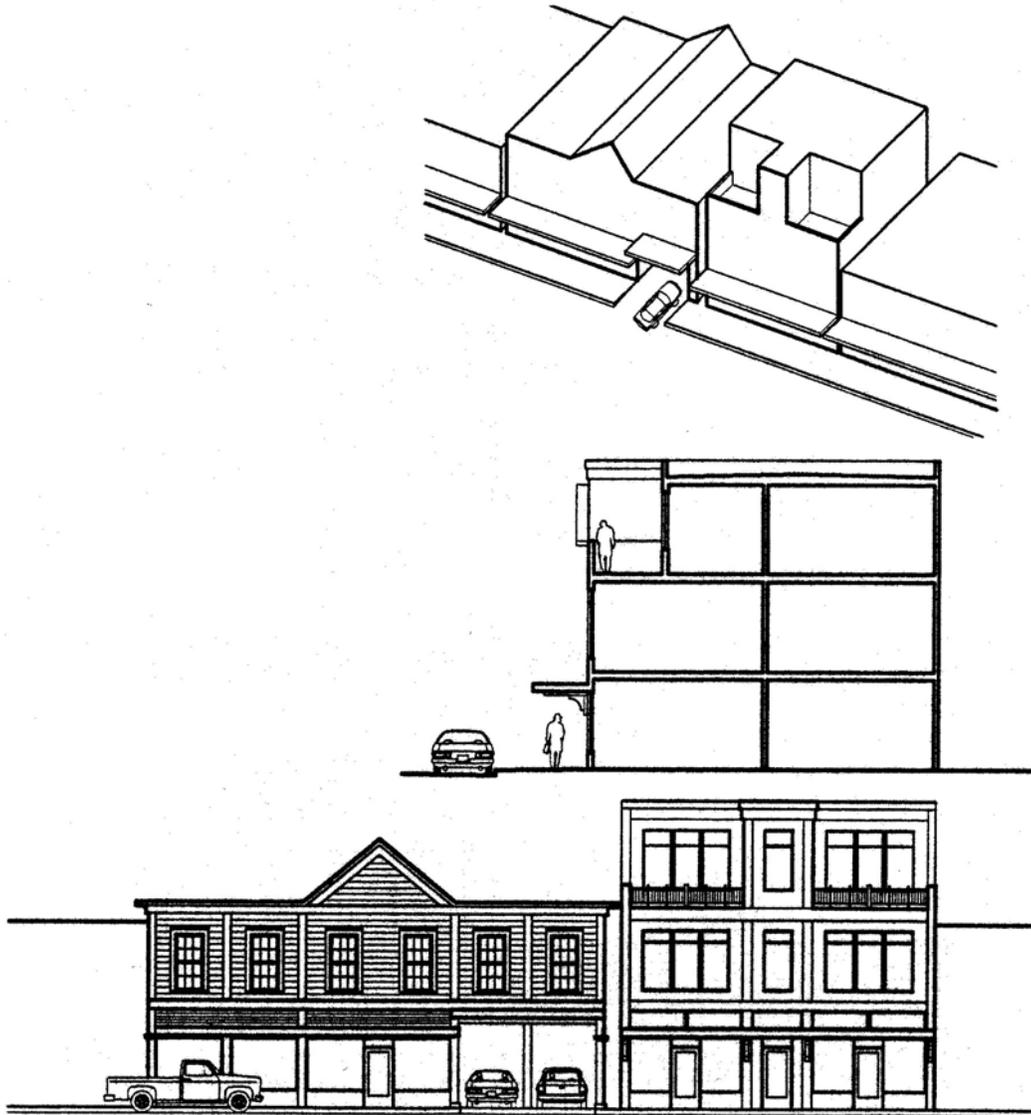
Stepping back the massing of a taller, new building, retains the typical height of the street wall. Shown here, the stepped back portion forms private balconies for residential or office use.
